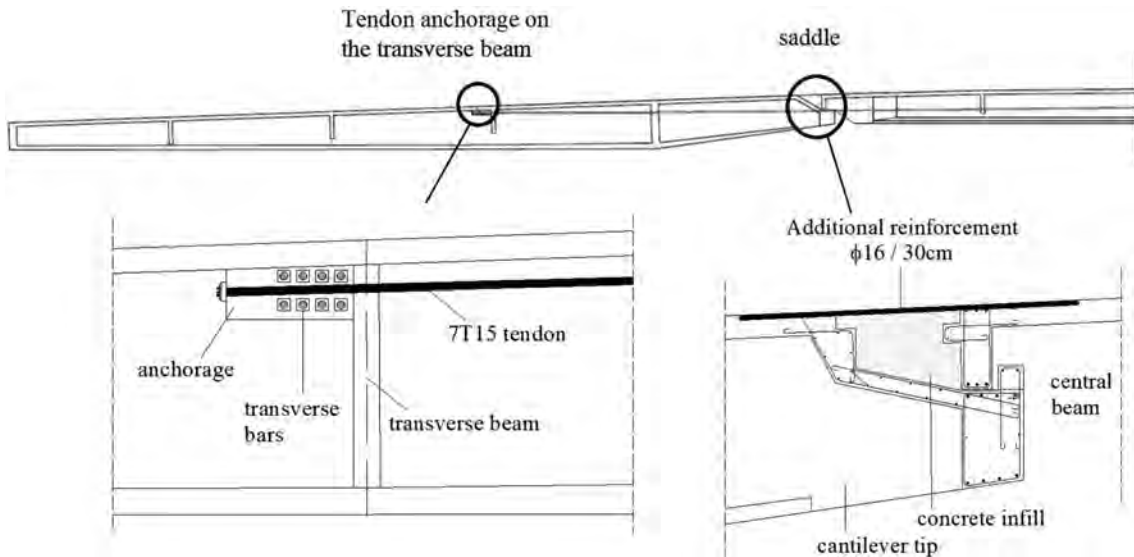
Details of retrofitting with external prestressing of the first case-study
